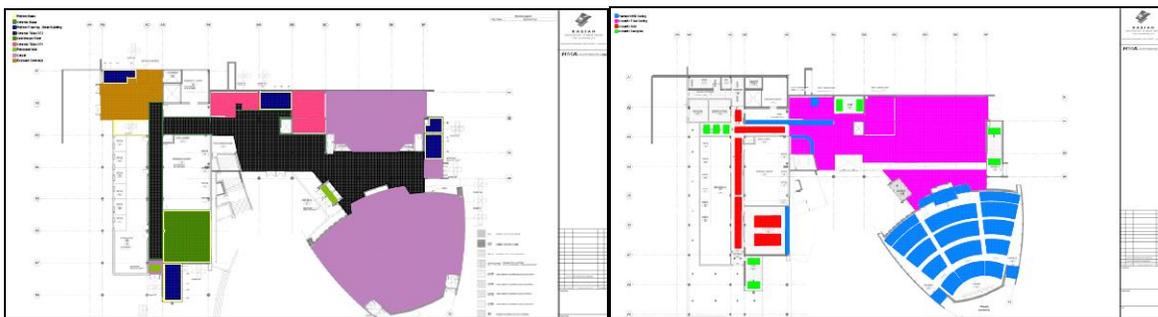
Colour-marking of different (a) floor finishes in the floor plan, and (b) ceiling types and finishes in the reflected ceiling plan
